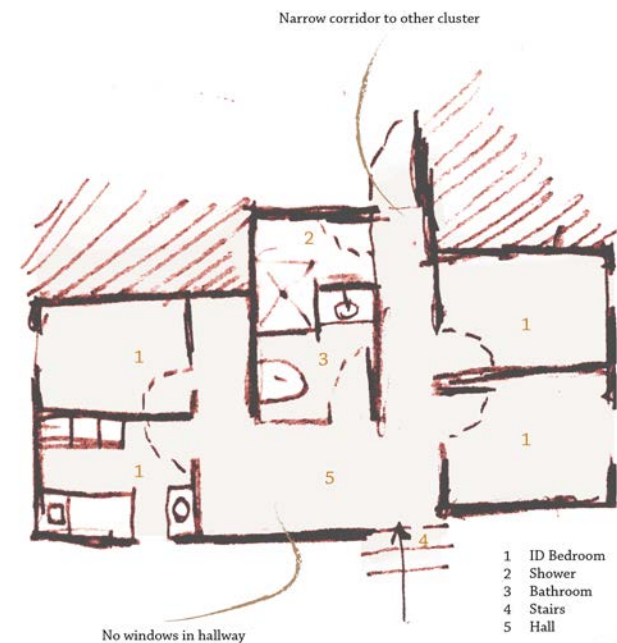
Jongerenwoonvorm: diagrammatic sketch of the first-floor plan with the bedrooms.
